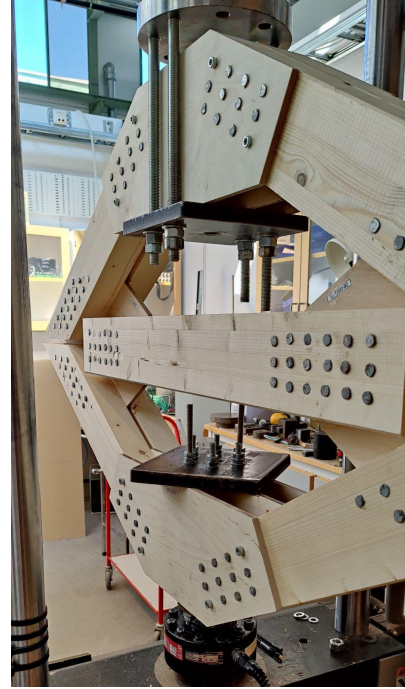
Tensile mounting supports made out of steel rods and metal plates
